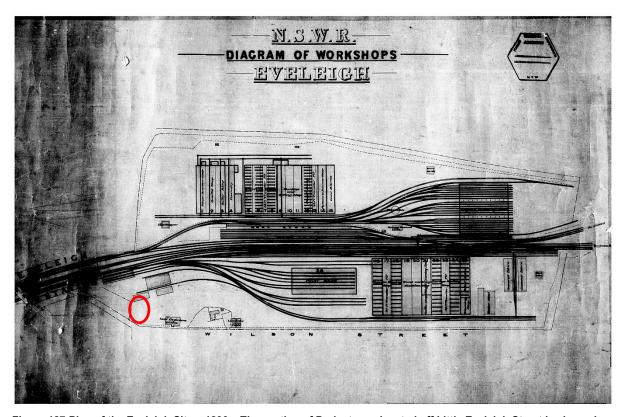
Plan of the Eveleigh Site c.1890s. The section of Project area located off Little Eveleigh Street is shown in red (Source: OCP Architects 2017).
